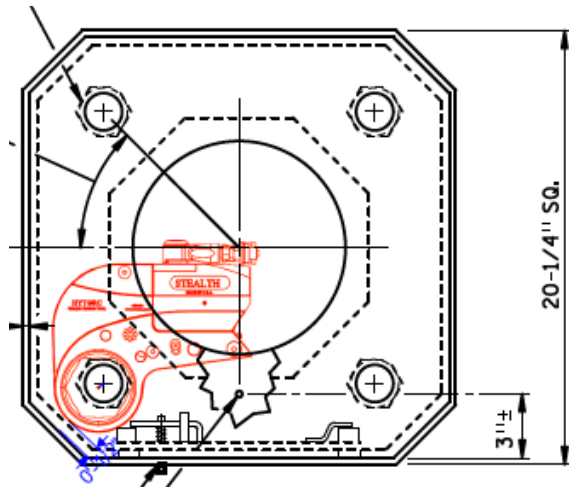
CADD modeled hydraulic wrench clearances
